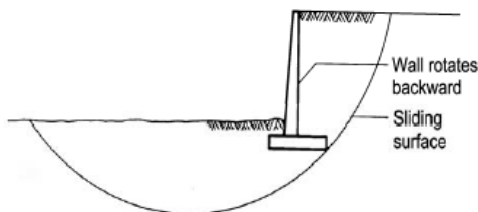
Retaining Wall Overall Stability Failure
